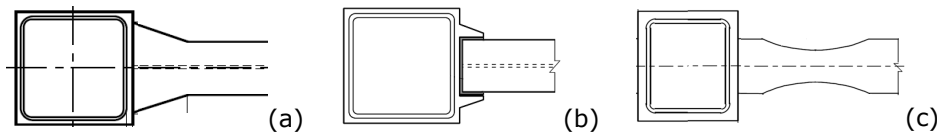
Examples of through diaphragm connections: (a) with horizontal haunches, (b) with U-shaped welded joints, and (c) reduced beam section (RBS) connections [51]
